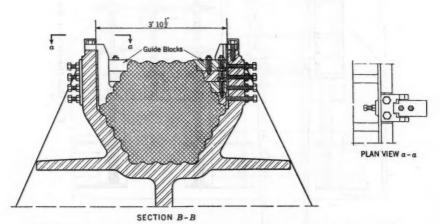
TYPICAL SECTIONS, TOP OF TOWER (SEE, ALSO, FIGS. 14 AND 15).
